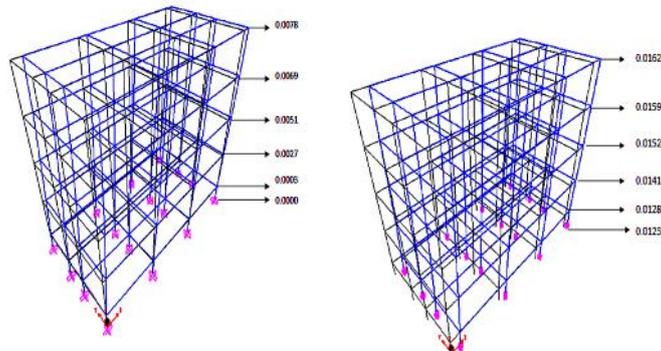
Deflected shape of G+3 building with fixed base, Fig 12: Deflected shape of G+3 building with rubber bearing
